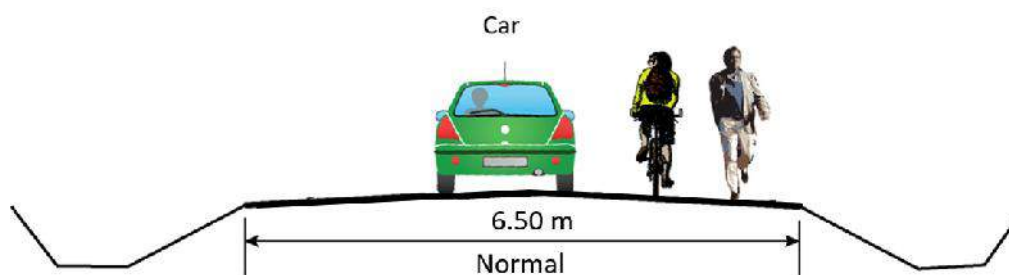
Typical Traffic Situation (LVRR 4 Standard - schematic)
